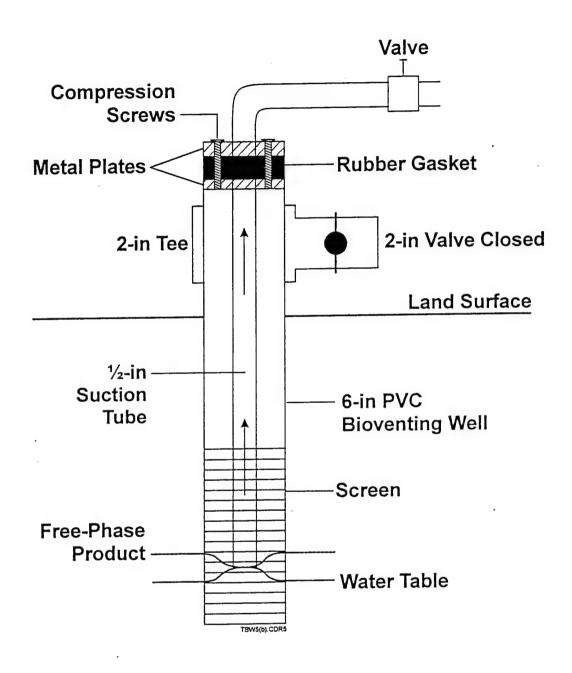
Drop Tube Placement and Valve Position During the Bioslurper Pump Test
